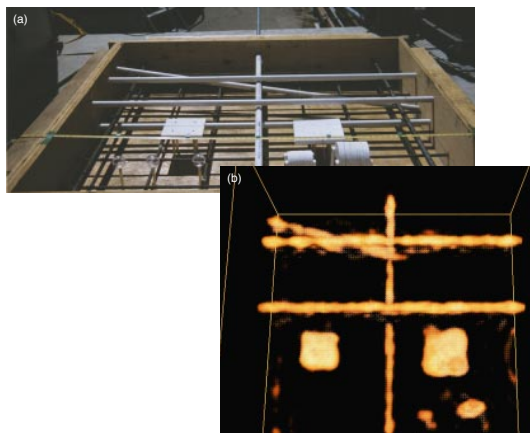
Imaging steel in concrete with MIR. (a) The internal elements of a concrete slab before pouring. (b) Reconstructed 3-D MIR image of the elements embedded in the finished, 30-cm-thick concrete slab.
